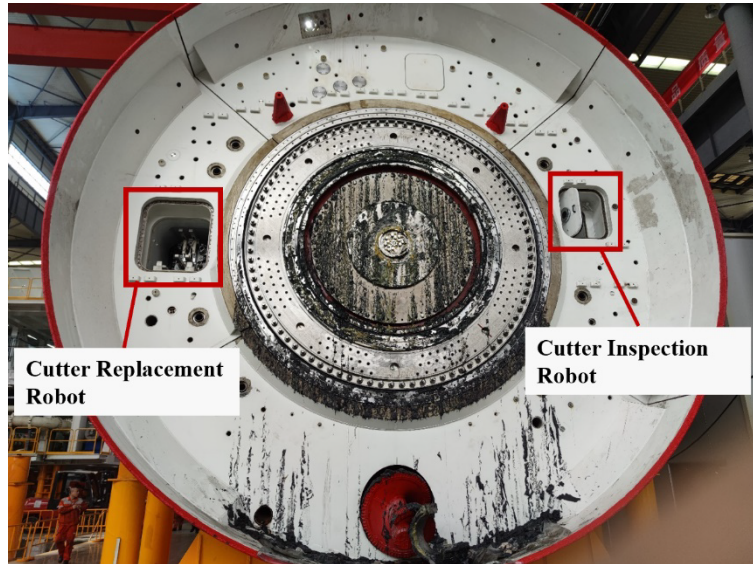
The inspection-and-replacement system deployed on the 'Pioneer II' TBM
